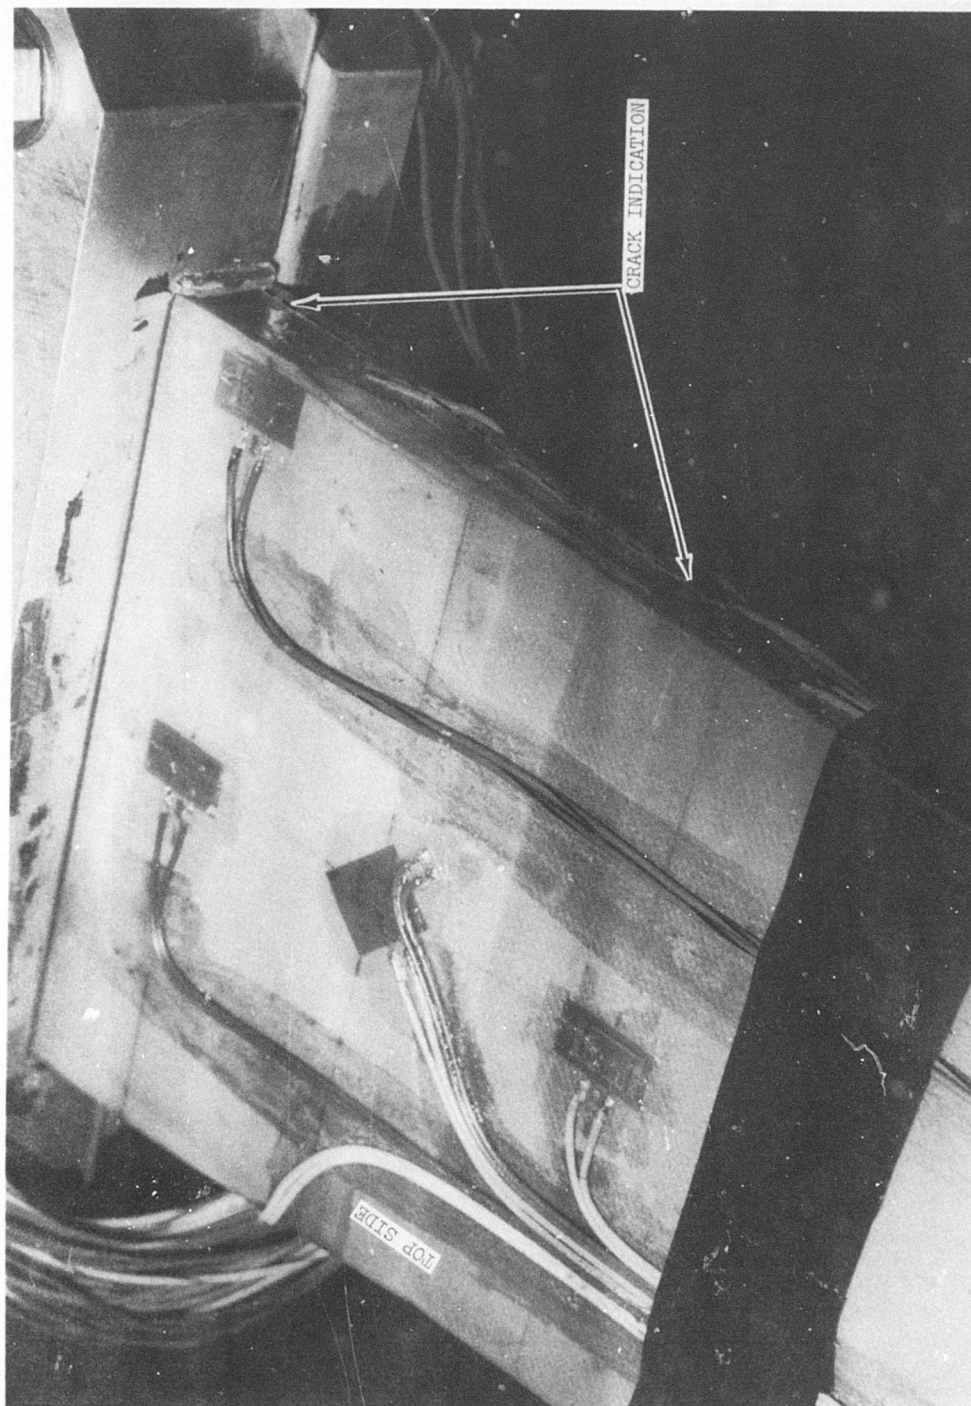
Closeup of Fatigue Test Specimen Depicting Crack Indication.
